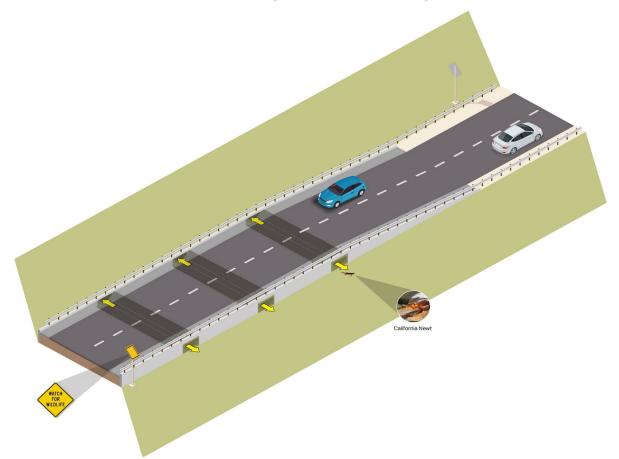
View of Type 6 Elevated Road Segment (with Type 4 Passage Structure; not to scale)
